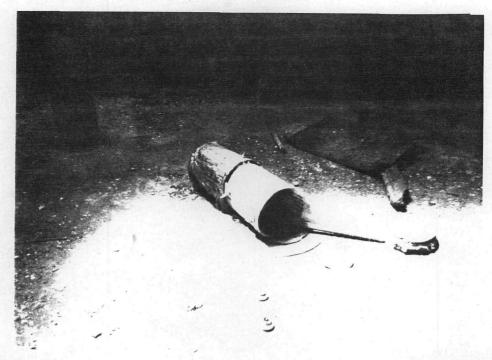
Location: Building 6 Orientation: West Date: 07/23/91 Description:
